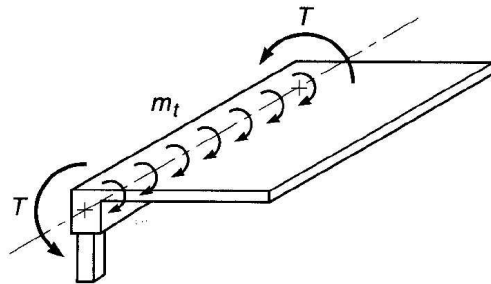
Beam subjected to torsion where closed stirrups should be adopted.
